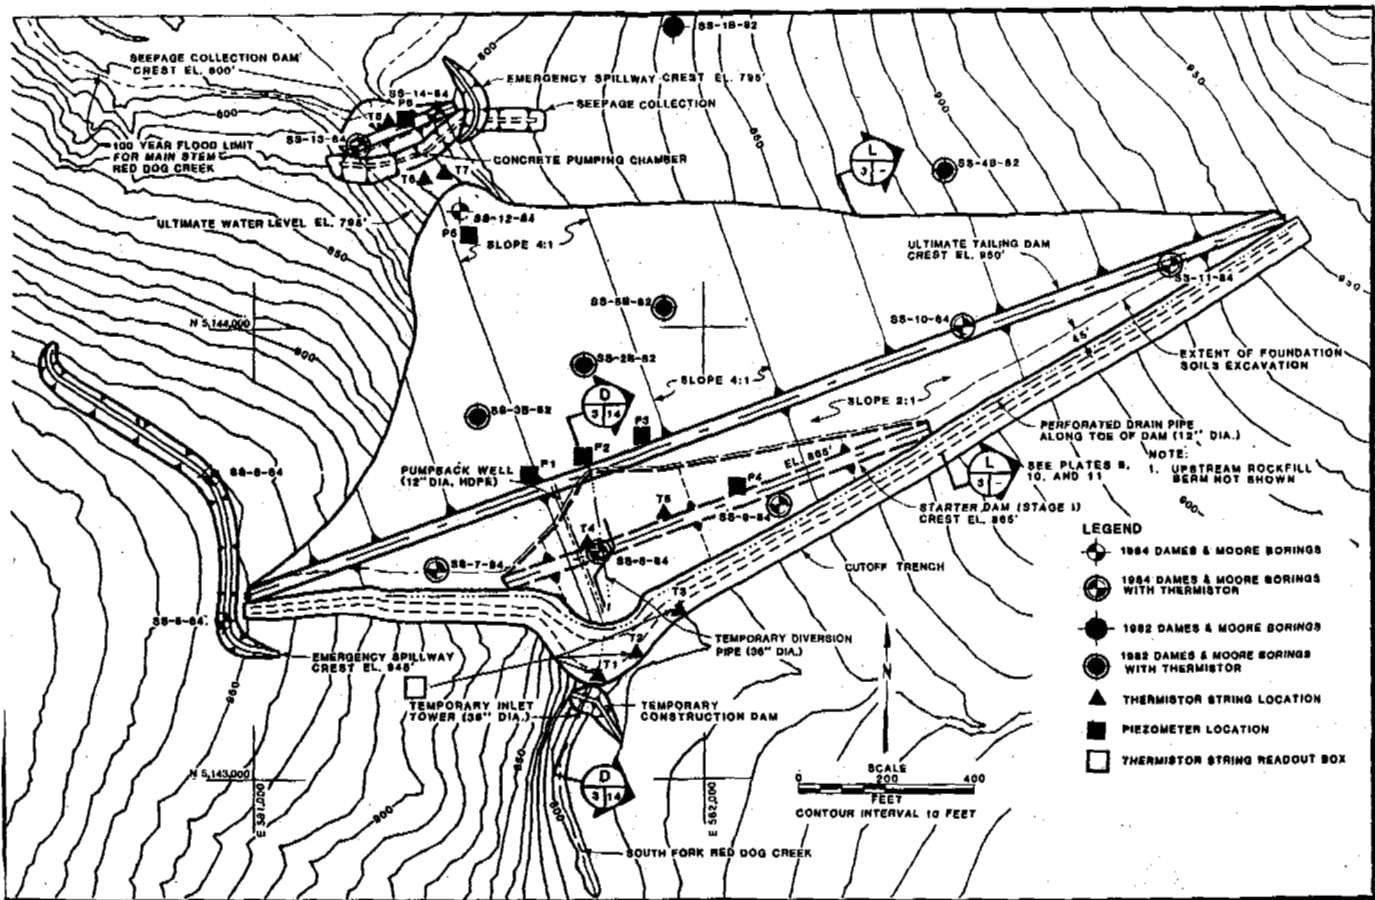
TAILINGS DAM SITE PLAN AND INSTRUMENT LOCATIONS
